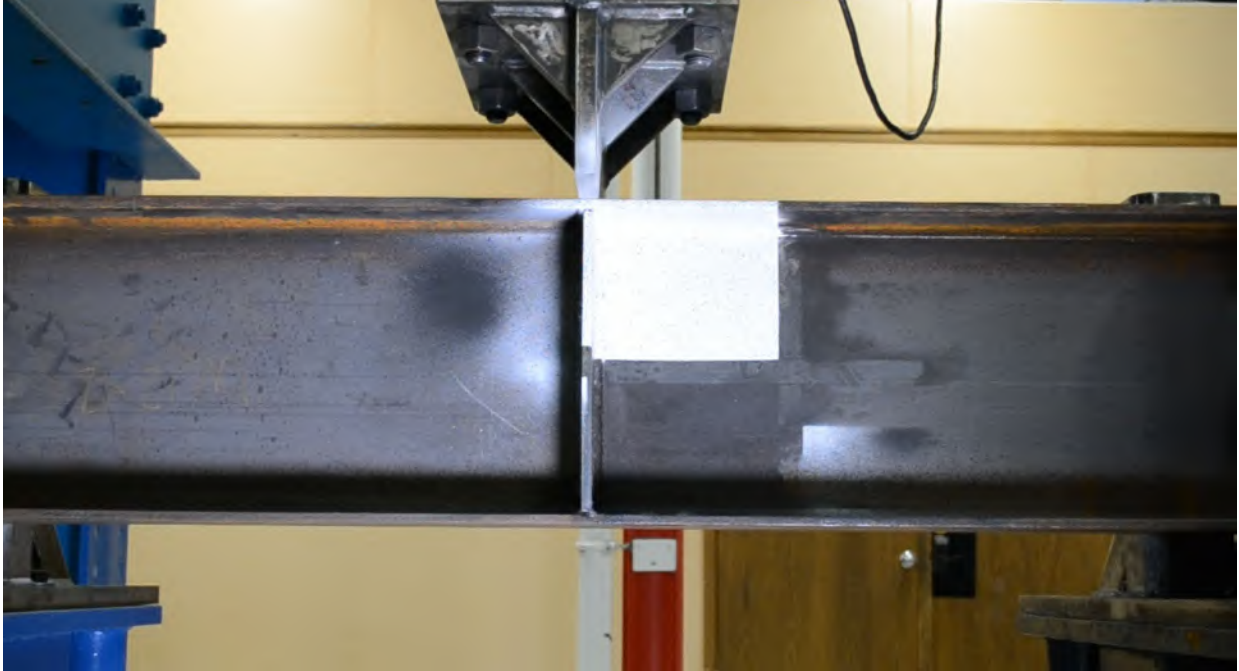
Close-up view of W12X26-SC-E2 after testing
